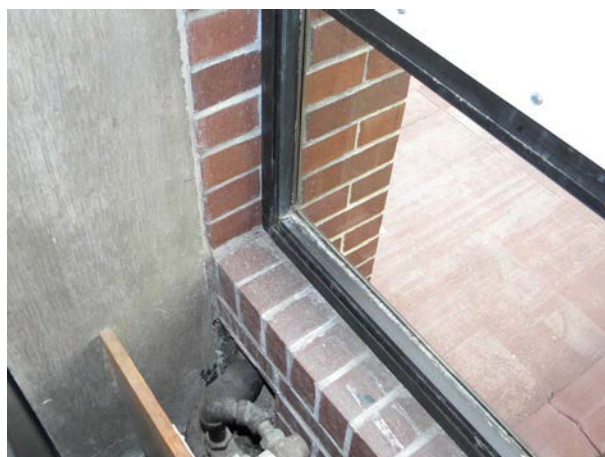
Interior brick at typical window jambs and sills, and interior concrete at brick piers.
